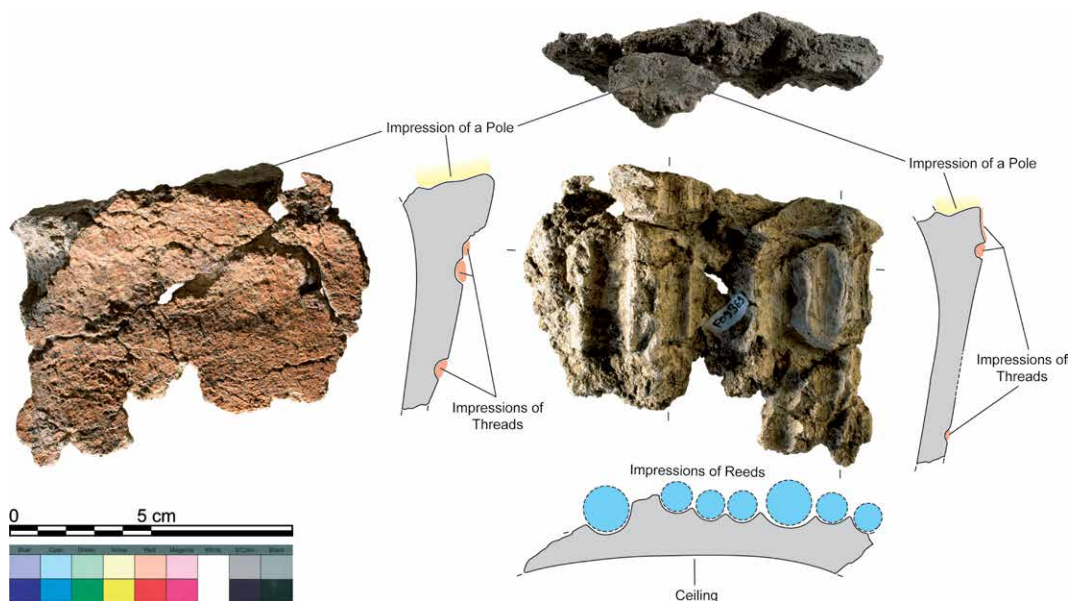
Transition fragment between ceiling and beam, F09369, 'group b' (Technical drawings: M. A. Negrete Martínez).
